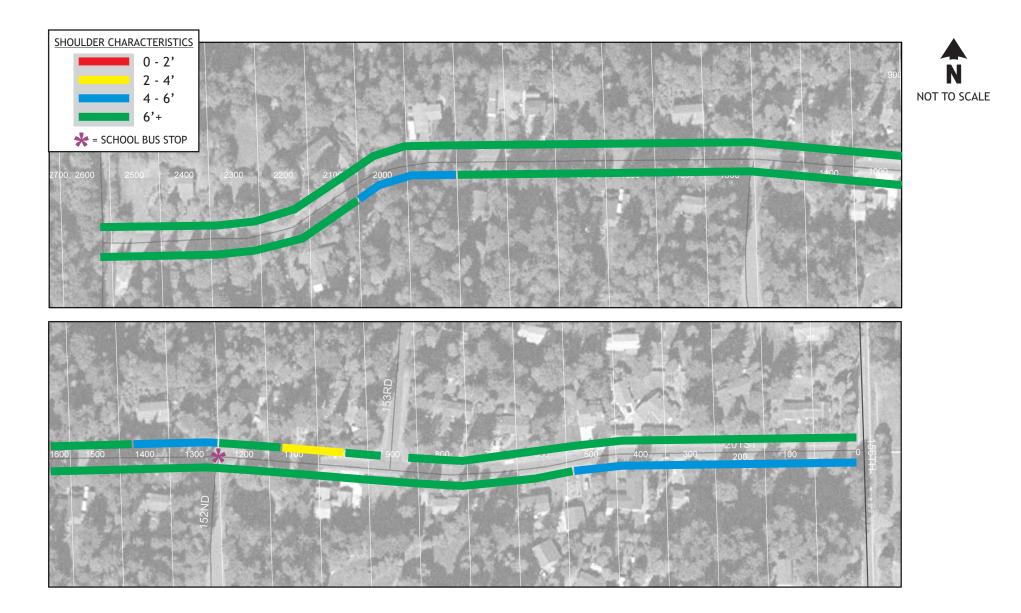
Roadway Shoulder Inventory (201st Street)
